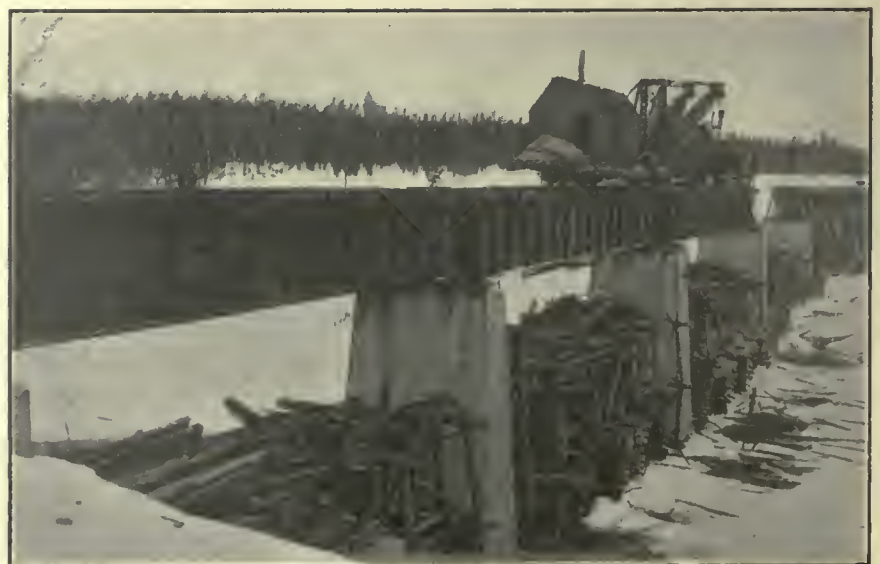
ERECTION CAR PLACING 100 FT. DECK PLATE GIRDER IN POSITION.
